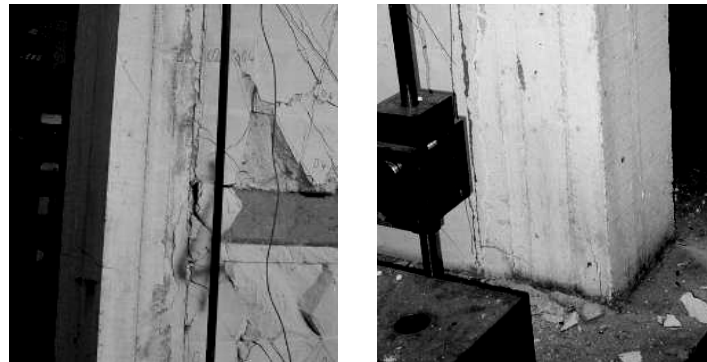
Damage to the frame columns induced by the mid-height r.c. beam
